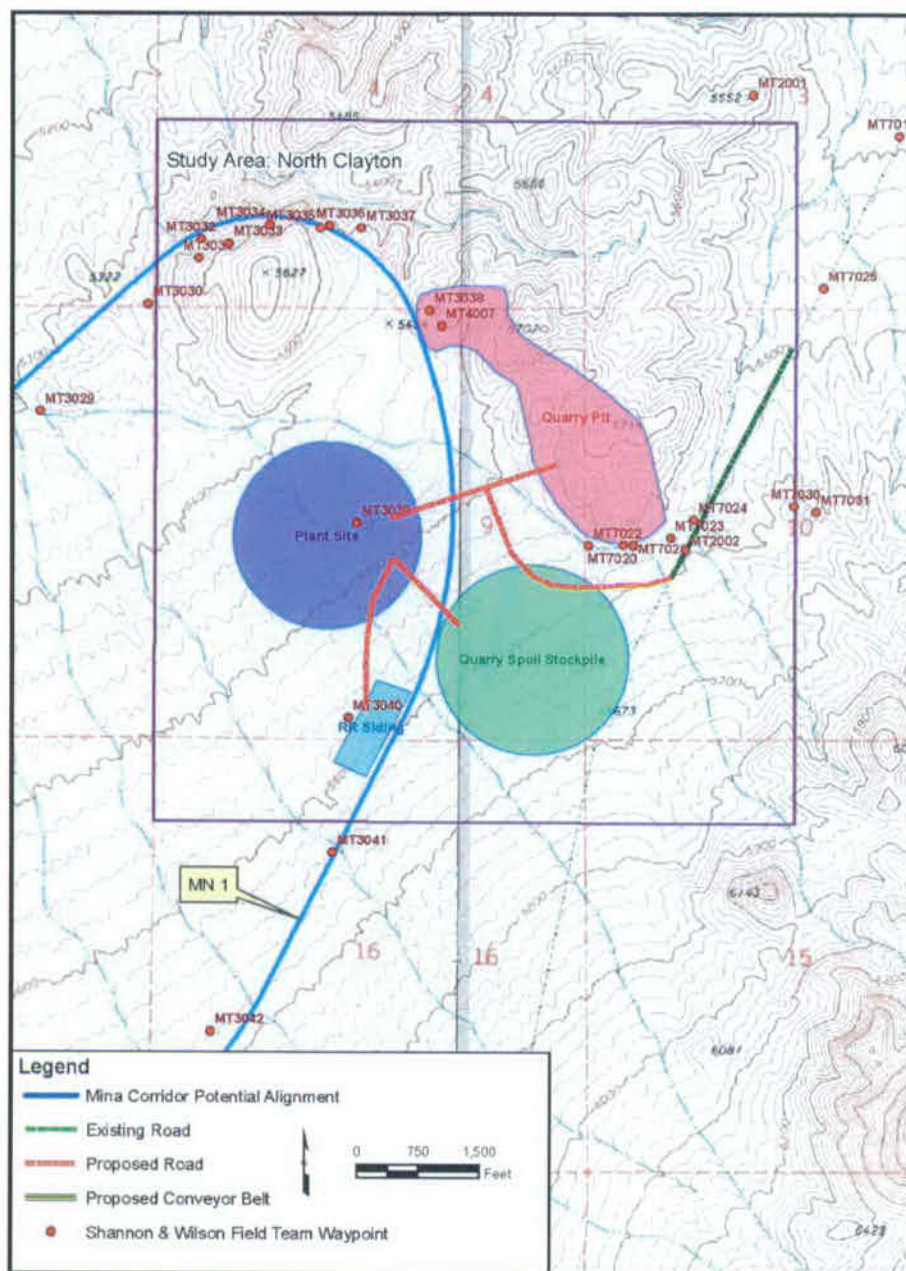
North Clayton Ballast Quarry Conceptual Layout
